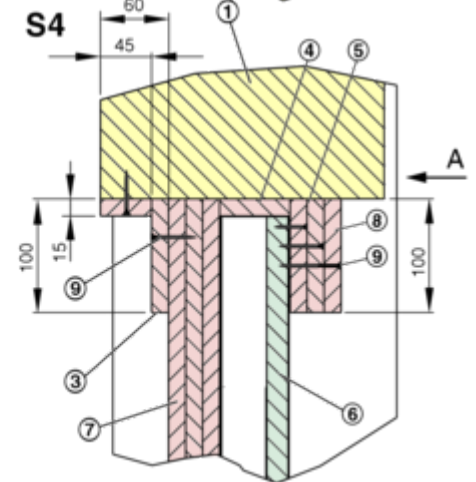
Details EK-JZ Dry installation in Gypsum Wall with metal stud EI 120 S
